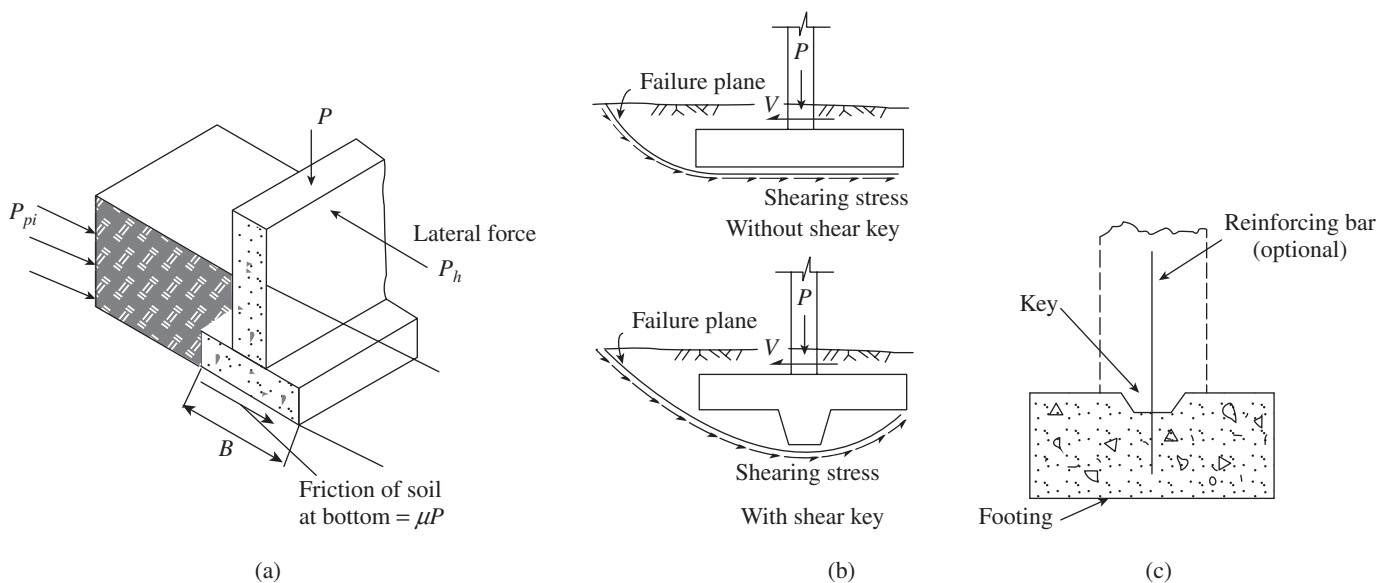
Stability against sliding (a) Forces resisting sliding (b) Concept of shear key (c) Shear key at the footing–column or footing–wall interface
